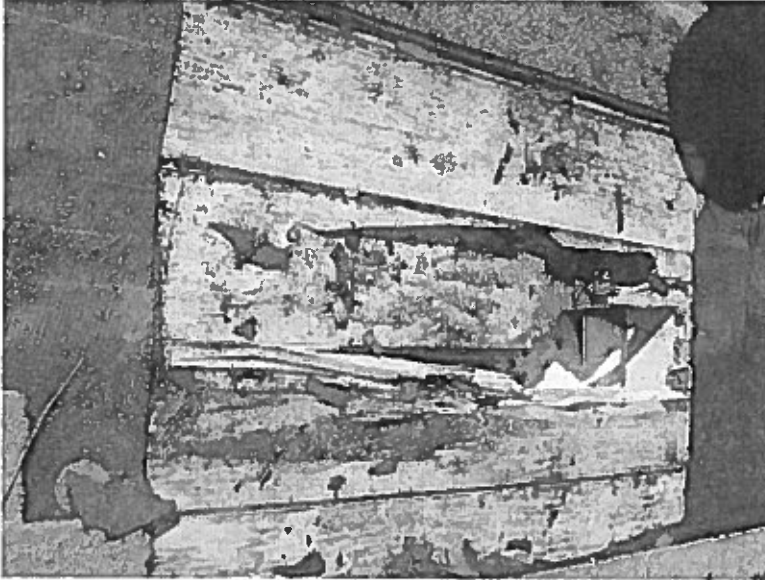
Fractured 1X8 tongue and groove roof sheathing.
